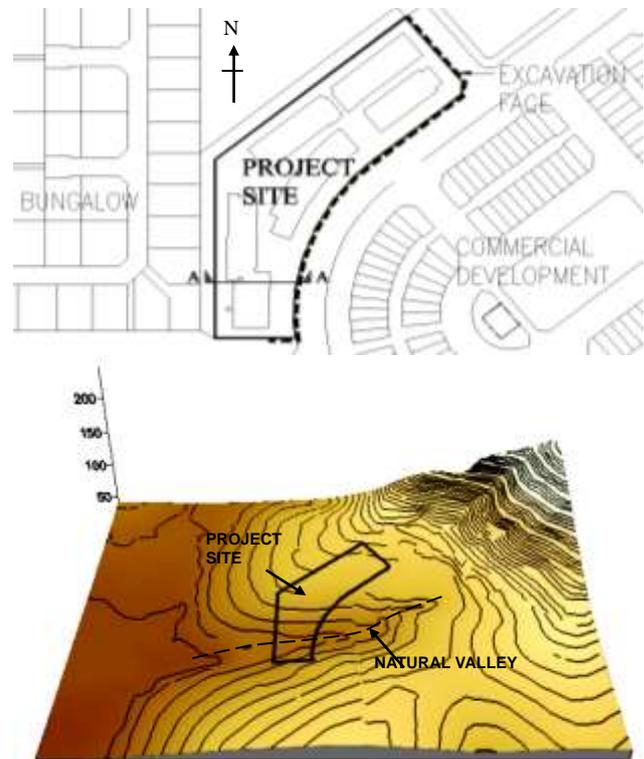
Layout of Basement Structure and Predevelopment Topographic Terrain
